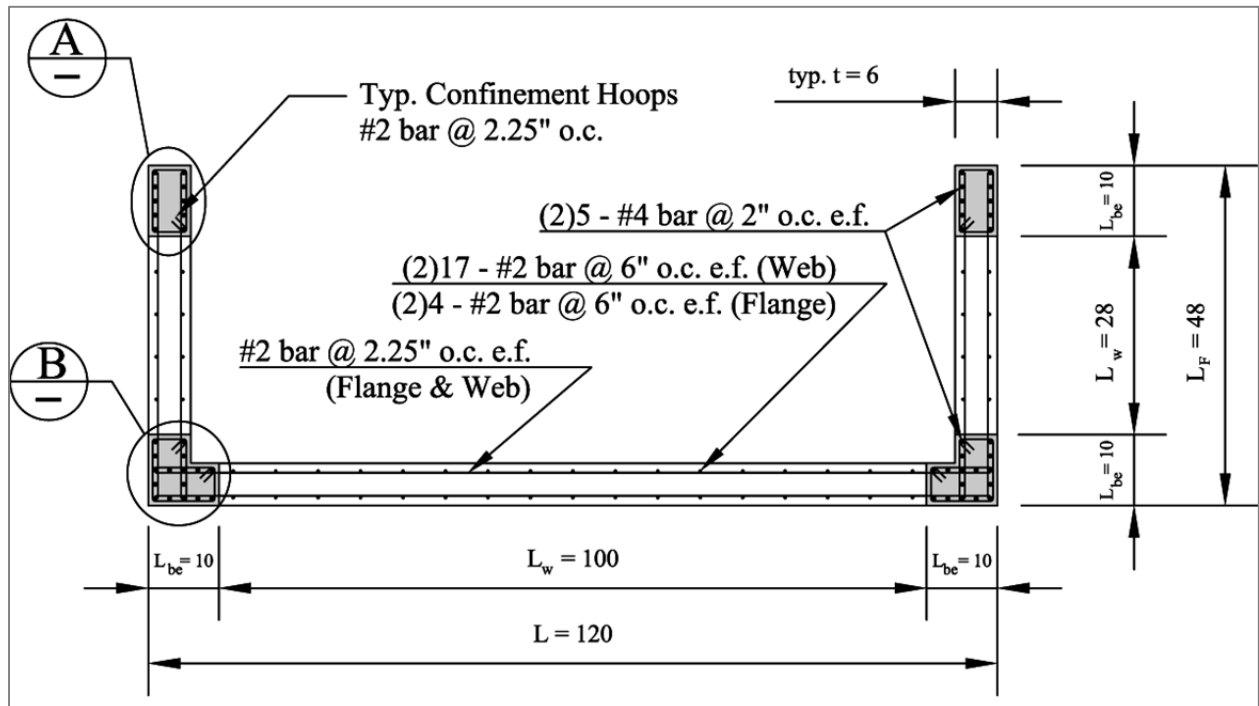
Wall 6/7/8 overall wall geometry and reinforcing (dimensions are provided in inches)
